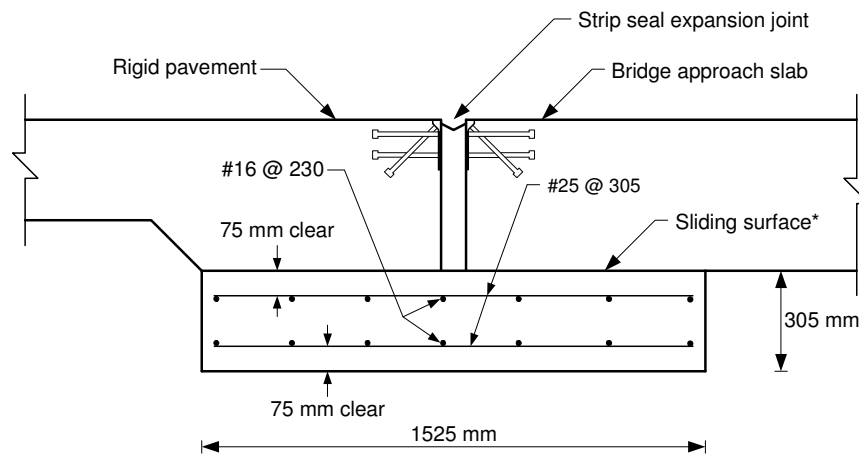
Typical Approach Slab Reinforcement Details
